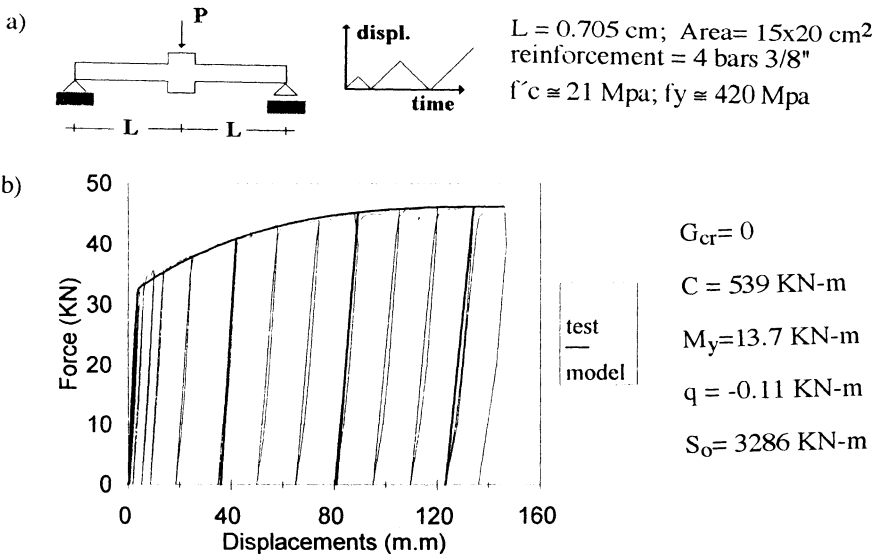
Test on a beam-column joint. a) specimen and loading b) experiment and numerical simulations.
